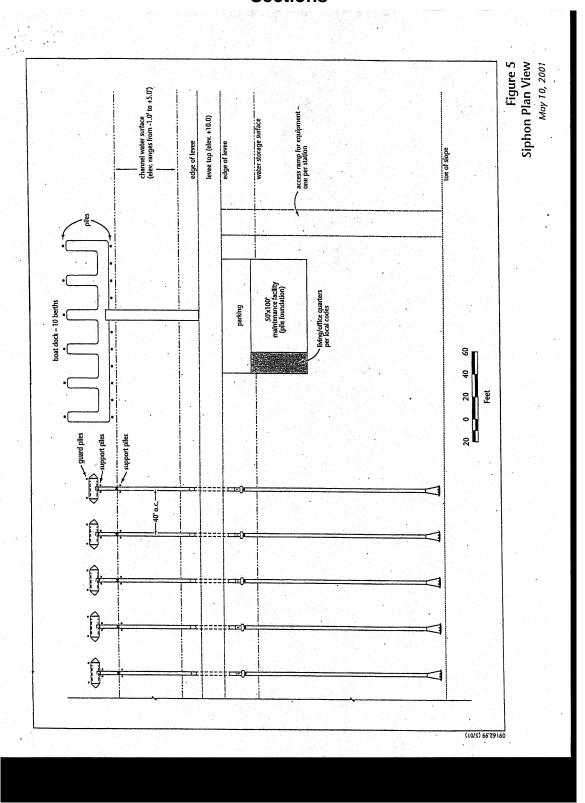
Delta Wetlands Project, Layout Plans and Cross Section
